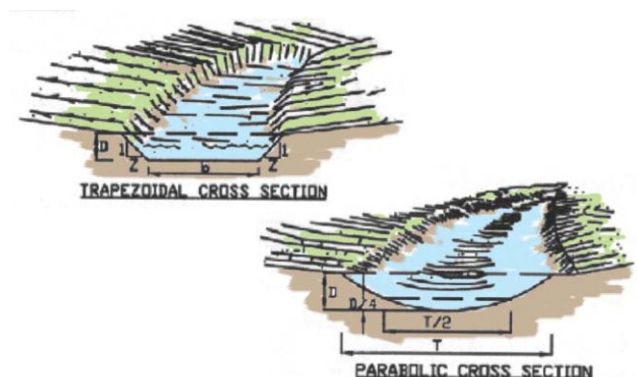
Typical channel cross sections for vegetated and lined waterways.
